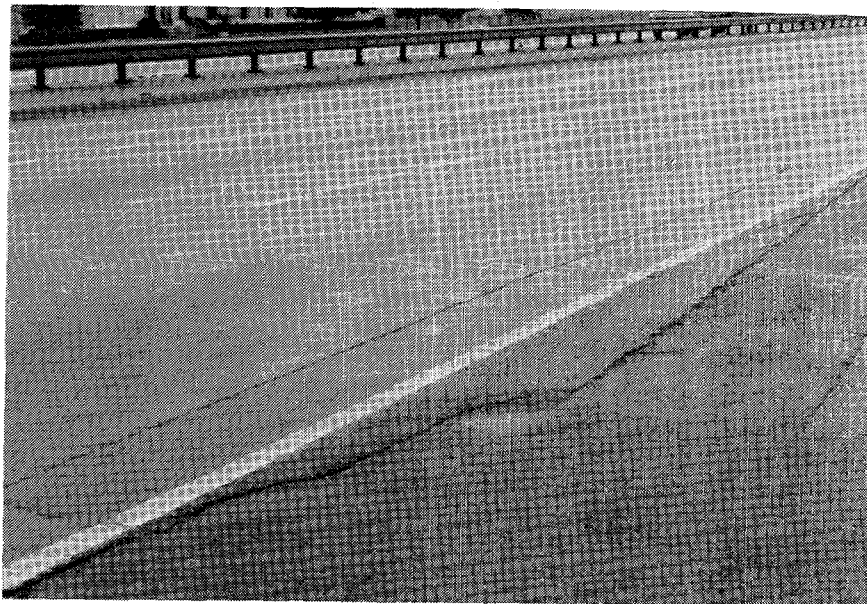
Illustration of edge distress on a continuously reinforced concrete pavement (CRCP-8, Dallas, Texas).
